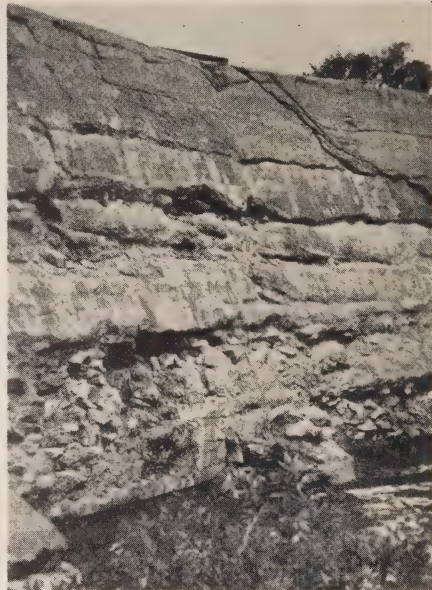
Typical sections of defective gravity wall prior to repair.
